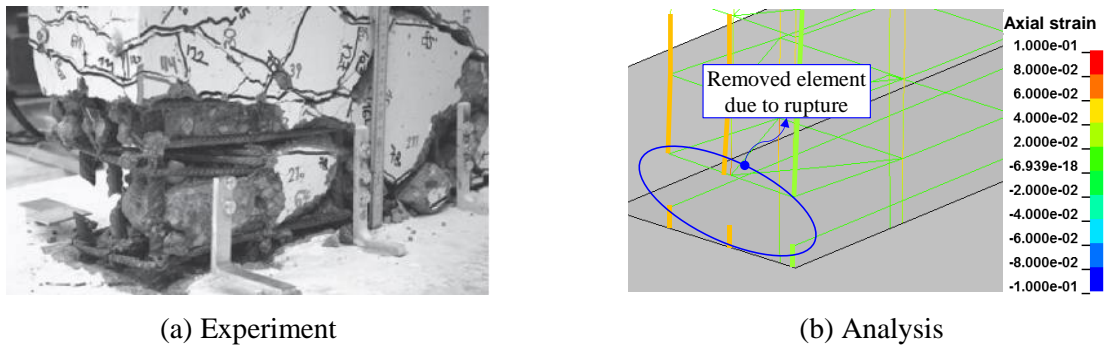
Rebar rupture in the U-shaped wall tested by Beyer et al. (2008).
